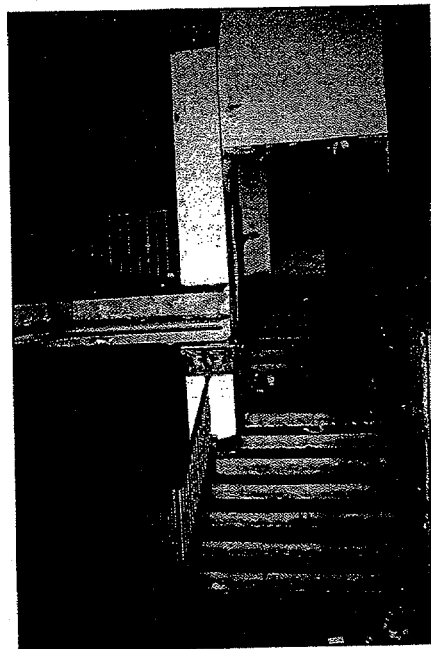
Golden Gate Theater, interior, view east from stair to balcony looking down into lobby and across into balcony level (Chattel Architecture 2009)
